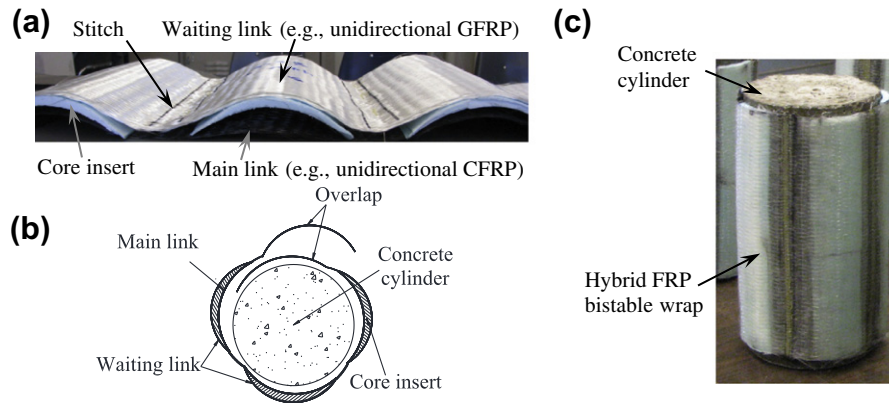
Design concept: (a) hybrid FRP bistable structure, (b) bistable-confined concrete and (c) picture of a typical testing specimen.
